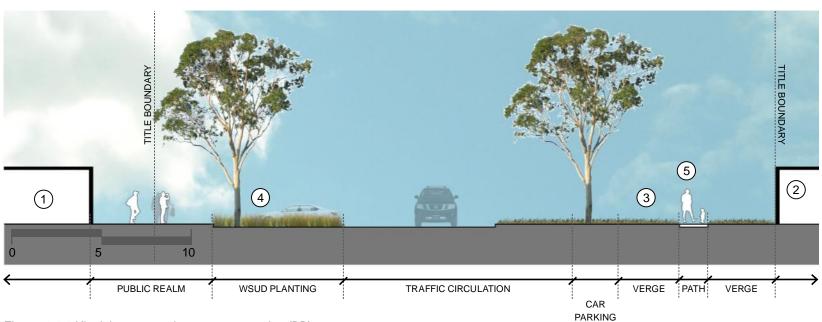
Kinglake proposed streetscape section (BB)
